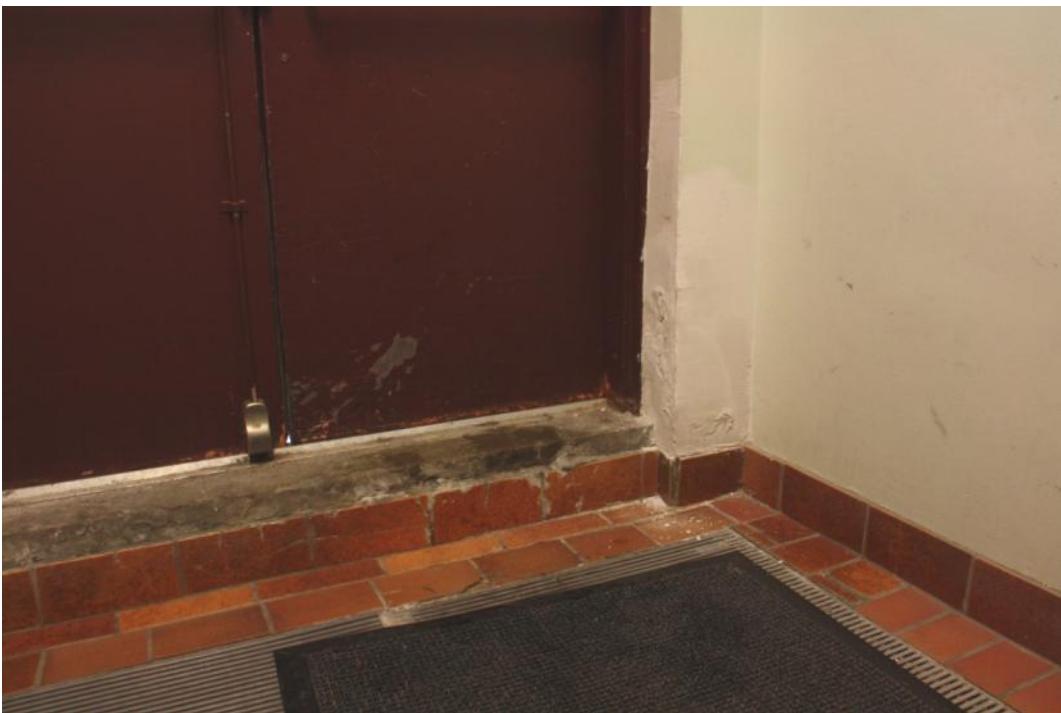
Deteriorated Rear Building Entrance (Basement Floor)
